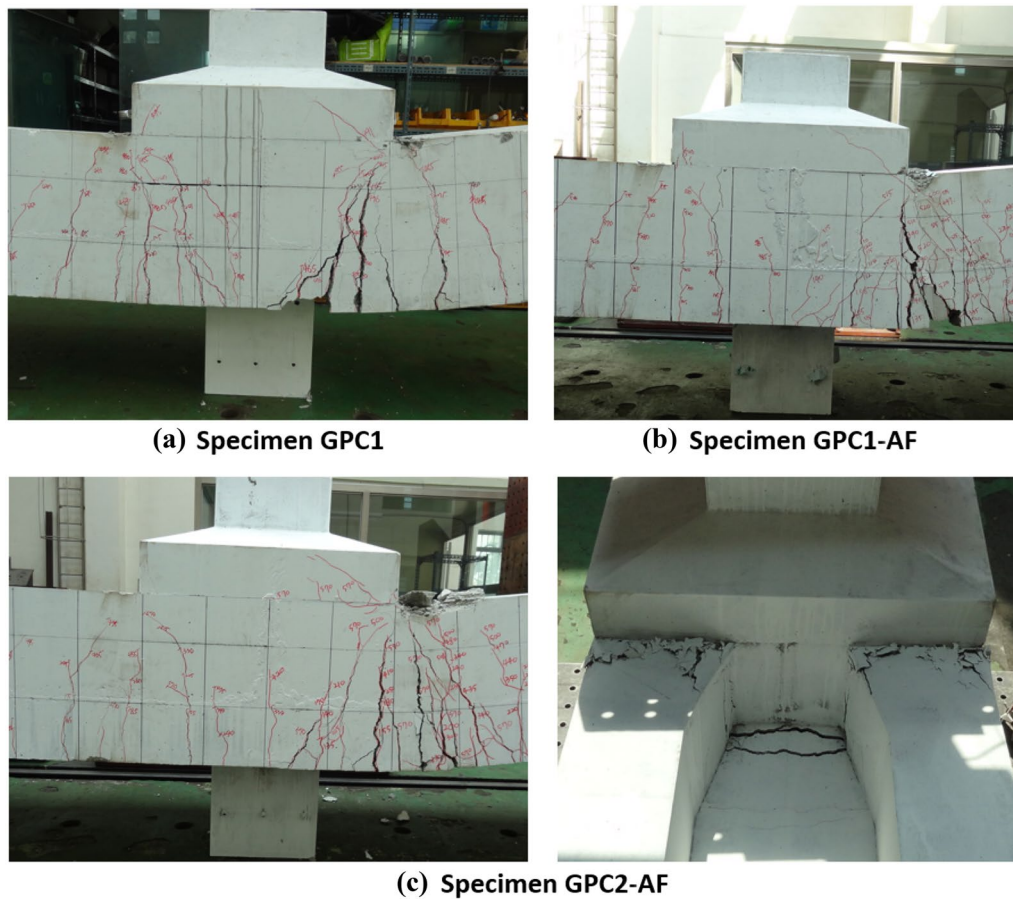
Damage modes of specimens under gravity loading at the end of the test.
